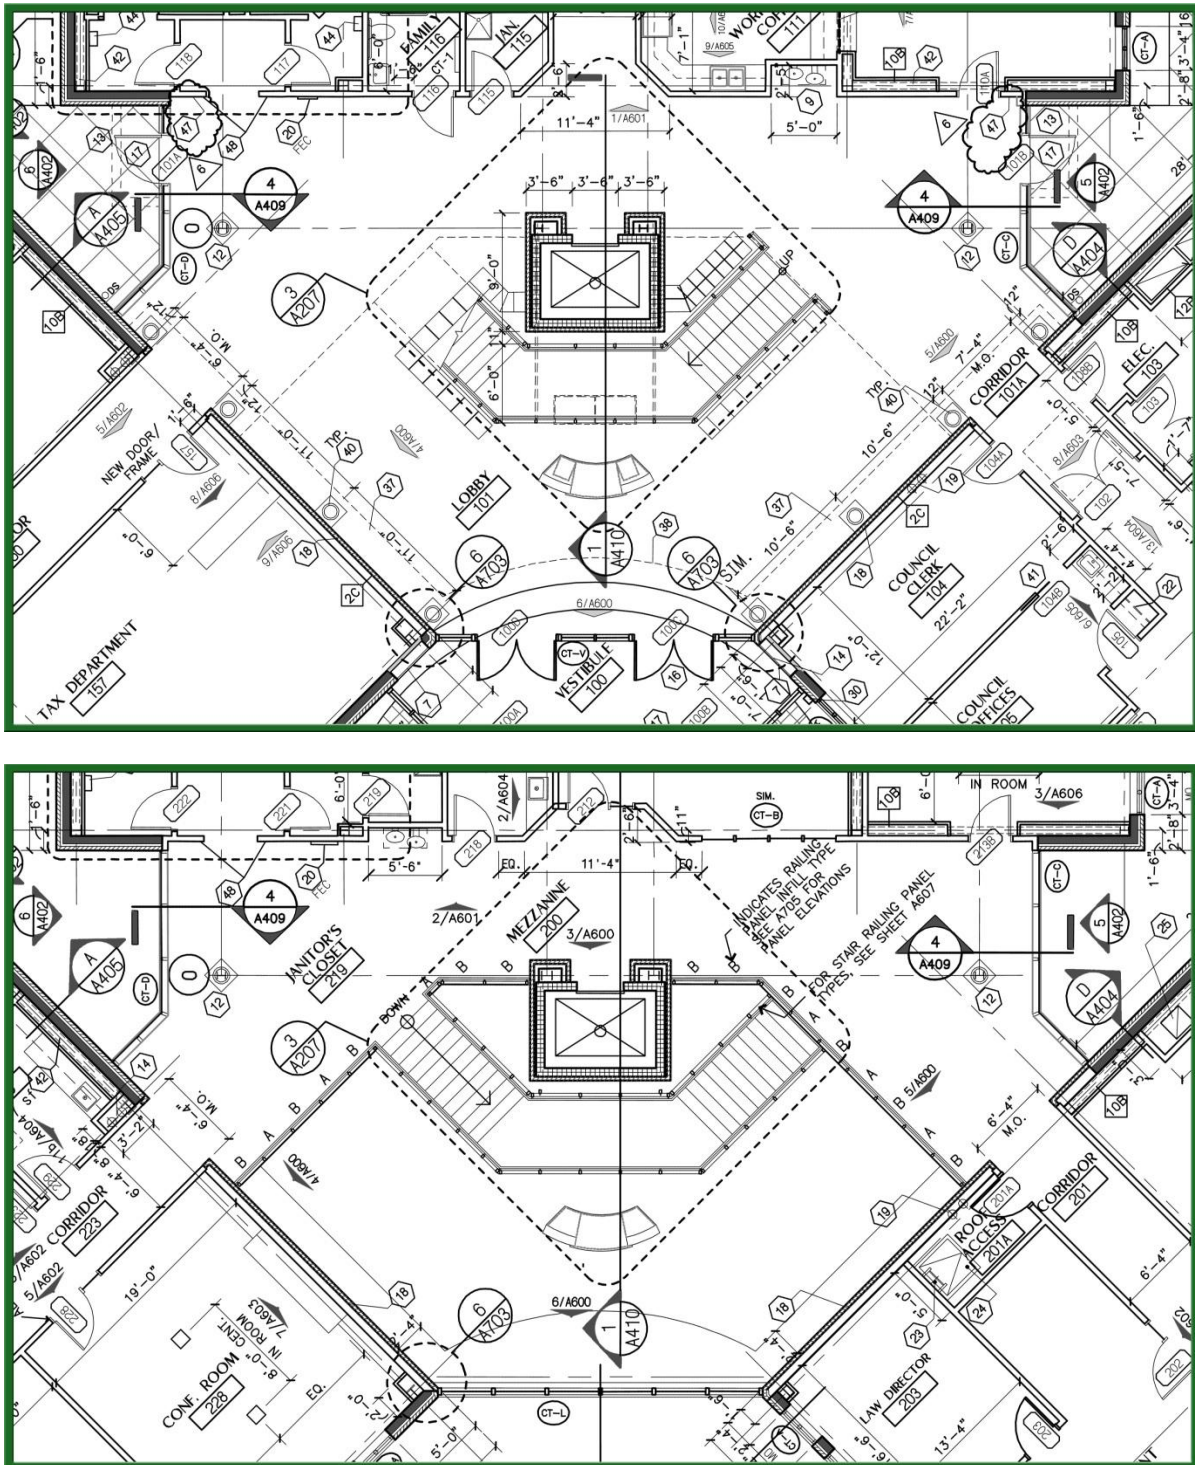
| Lobby Floor Plan (Ground and Mezzanine Floor)
